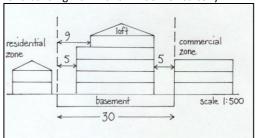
Minimum setback to the side and rear boundaries for a building wall with a window or balcony.
